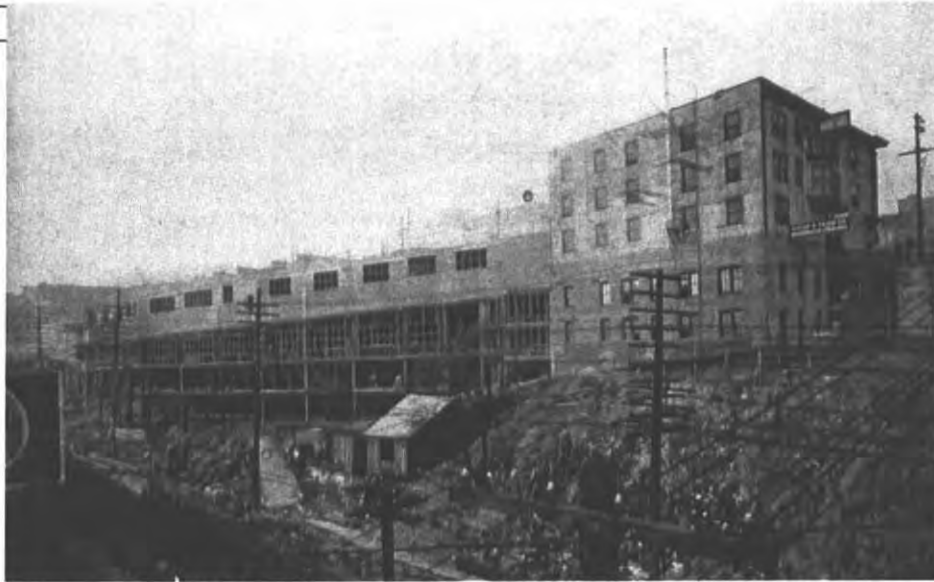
View NE of west and south sides of Leland Hotel above Western Avenue showing construction of first addition to Pike Place Market & Department Store Co. market building to the north, c.1911. Partial view of Outlook Plaza at left side of image. (Image provided by City of Seattle Historic Preservation Program)
